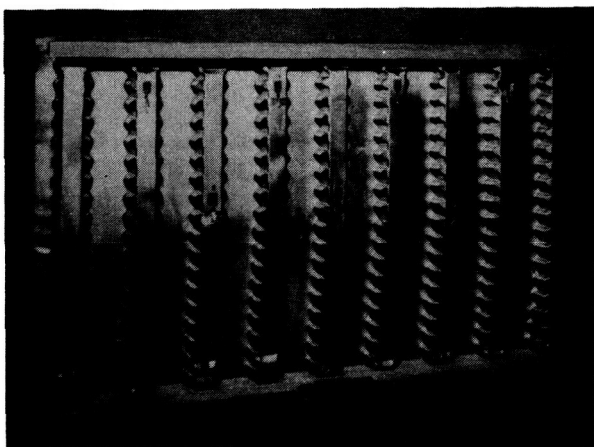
Beaded hat stiffened panel showing damaged stiffeners after collapse.
